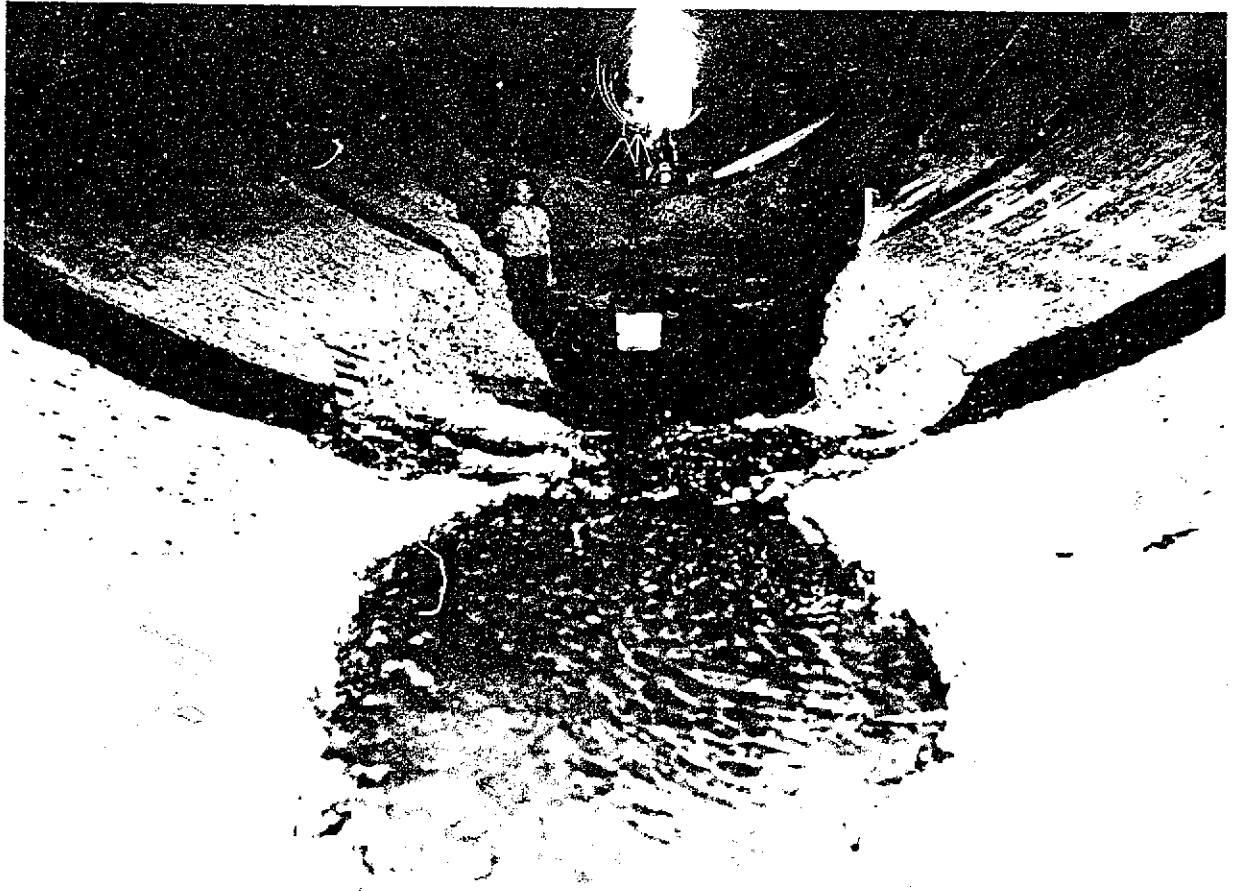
Looking downstream in major damaged area in horizontal reach of tunnel. Photo P459-640-4042
